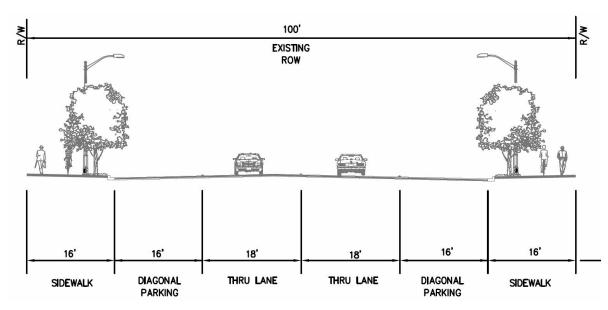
Proposed Cross Section, 3rd Avenue With Diagonal Parking
